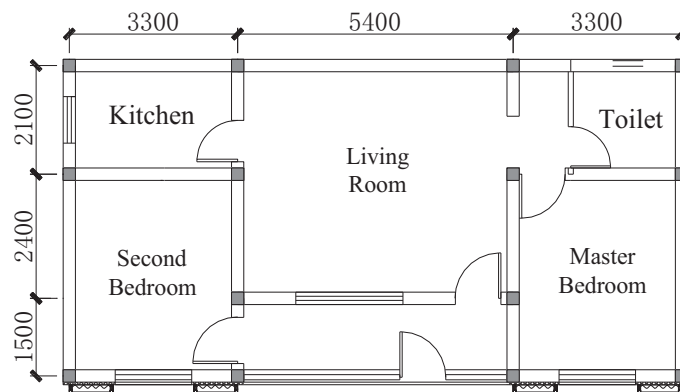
Plane layout and size of the demonstration project (unit: mm)
